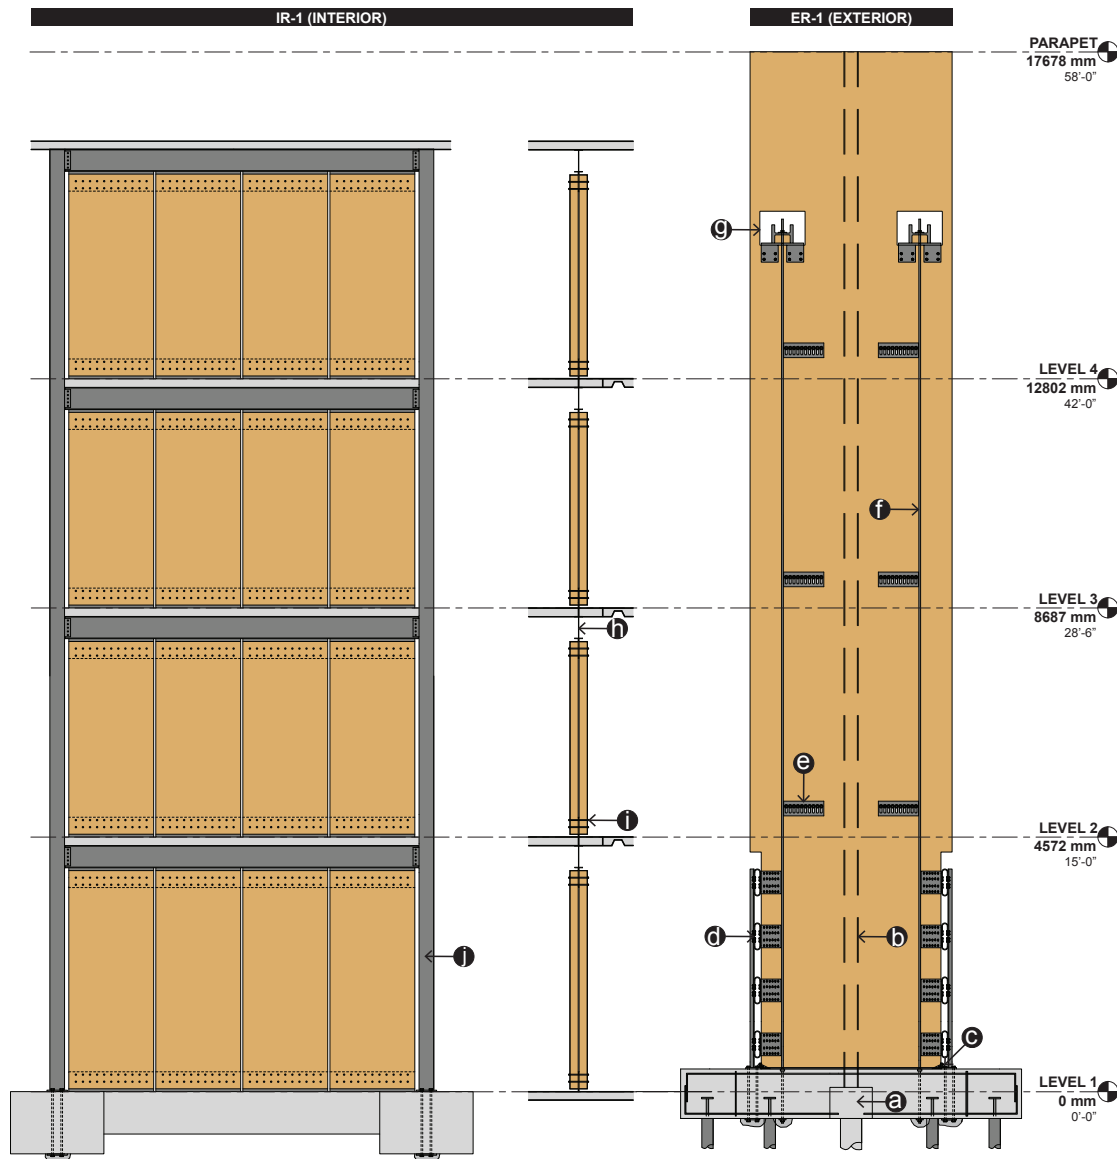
Lateral force-resisting system façade (ER) and core (IR) rocking wall panels. a. existing pile cap, b. existing steel column, c. MTP shoe, d. u-shaped flexural plates e. slotted slab connection, f. post-tensioned steel rod, g. post-tensioning MTP port, h. existing steel beam, i. through-bolted connection, j. existing steel columns
